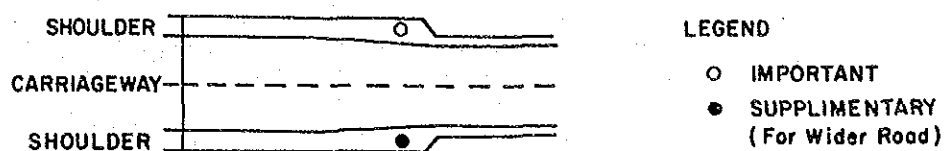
Typical Luminaire Arrangement (Width Transition)
